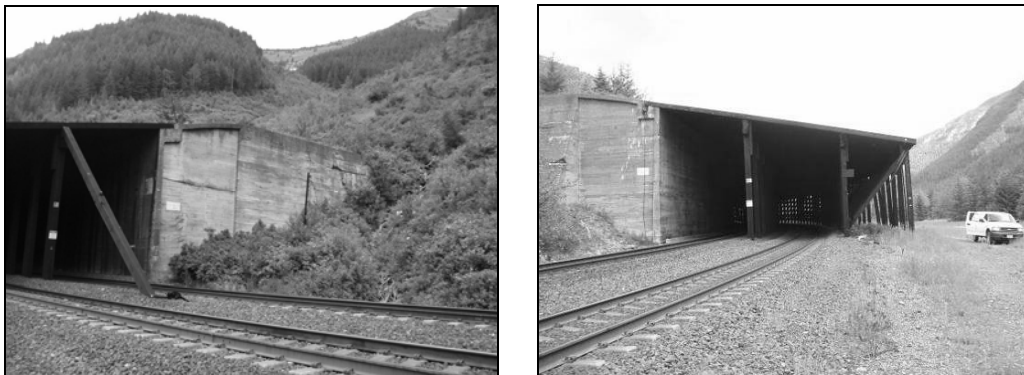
Concrete retaining wall of Snowshed 7 connecting to avalanche path.
